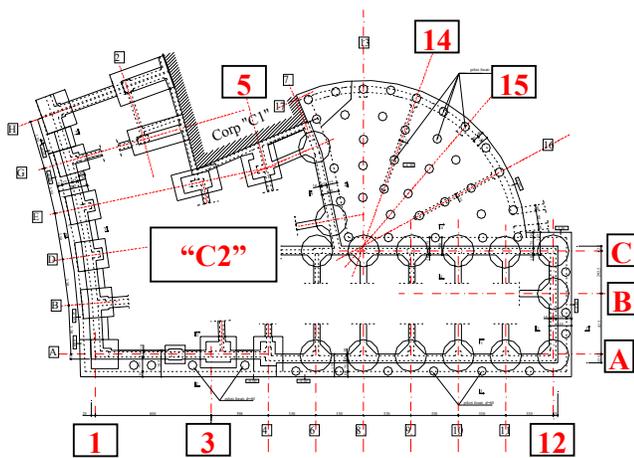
Foundation structures of the building "C2" in view of strengthening
